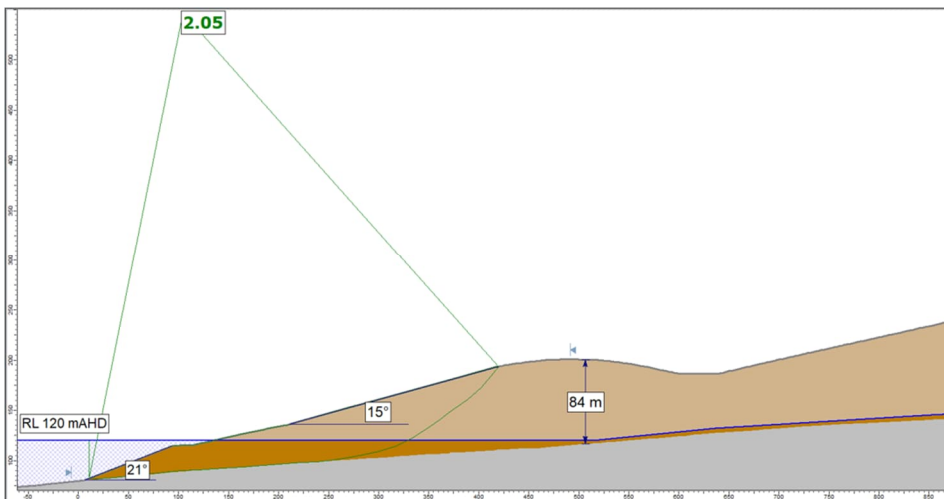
Slope stability model result for Section 2 (South) – East lowwall.
